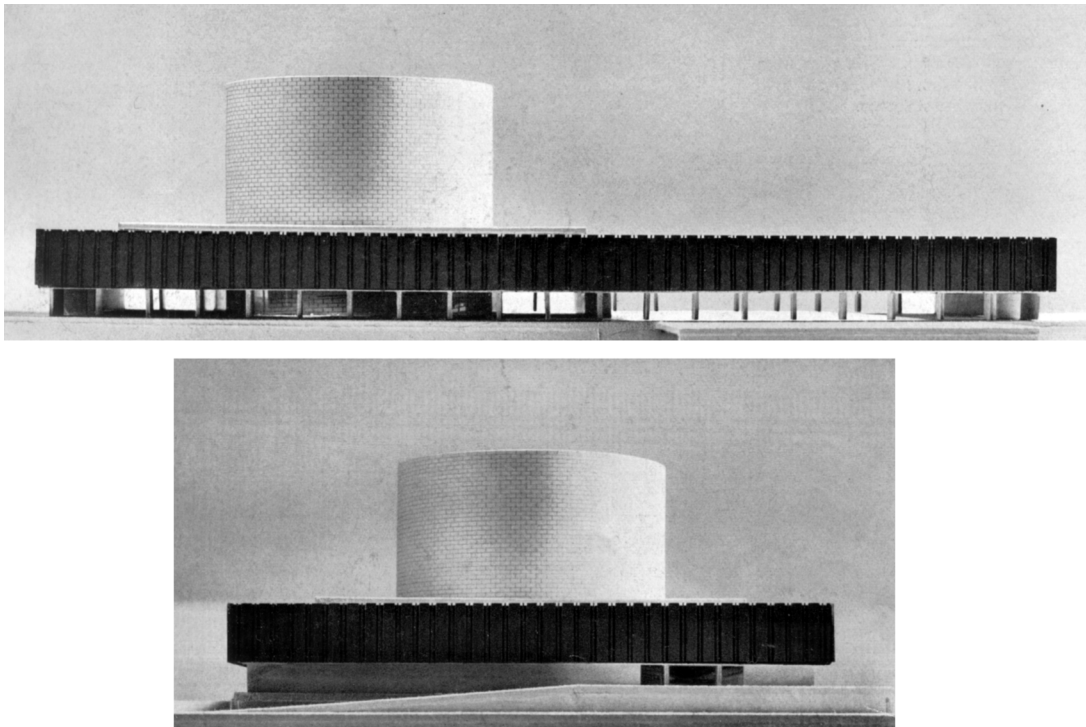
Proposed South West & South East elevations of Parliament building (1963).
